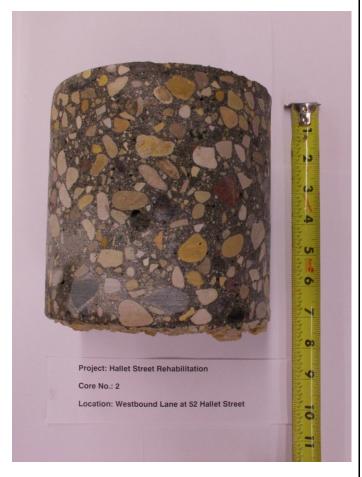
C02: Westbound lane at 52 Hallet Street, 1.0 m from curb
